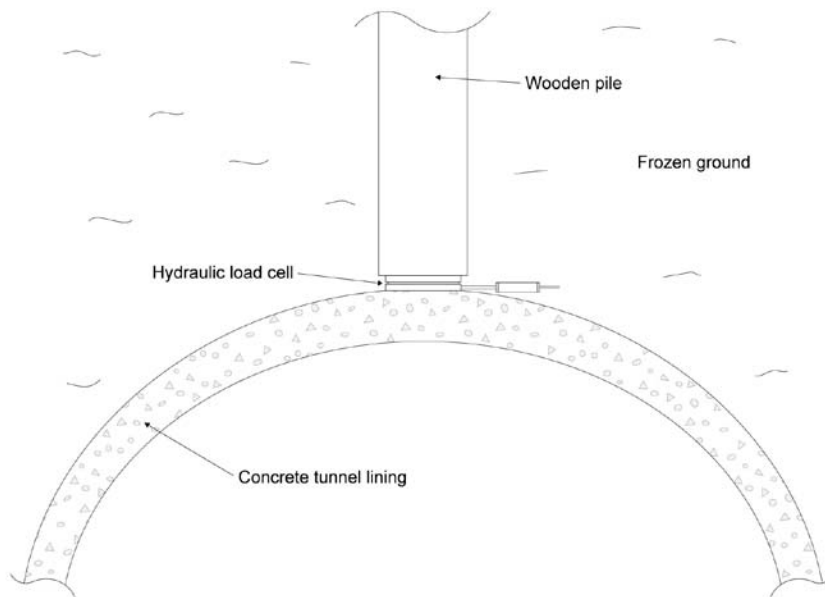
Model 4815 Hydraulic Load Cell Measuring Loads on a Tunnel Lining
